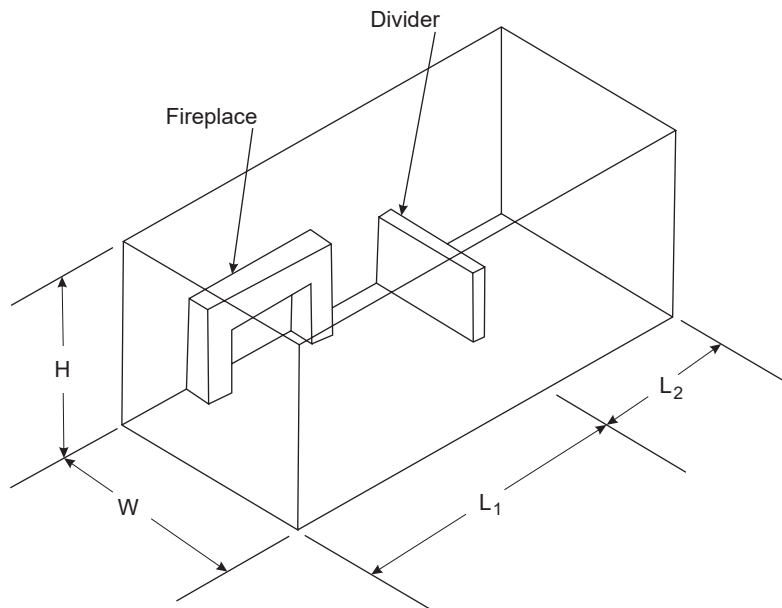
Example of a Large Room With 1/2 Wall Divider
